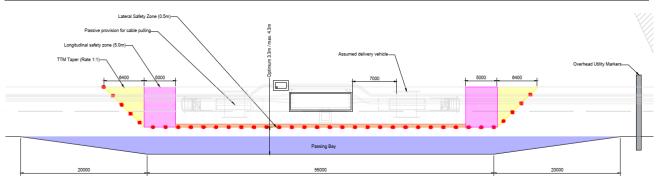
Indicative Traffic Management and Passing Bay Arrangement for a Joint Bay in the Roadway
